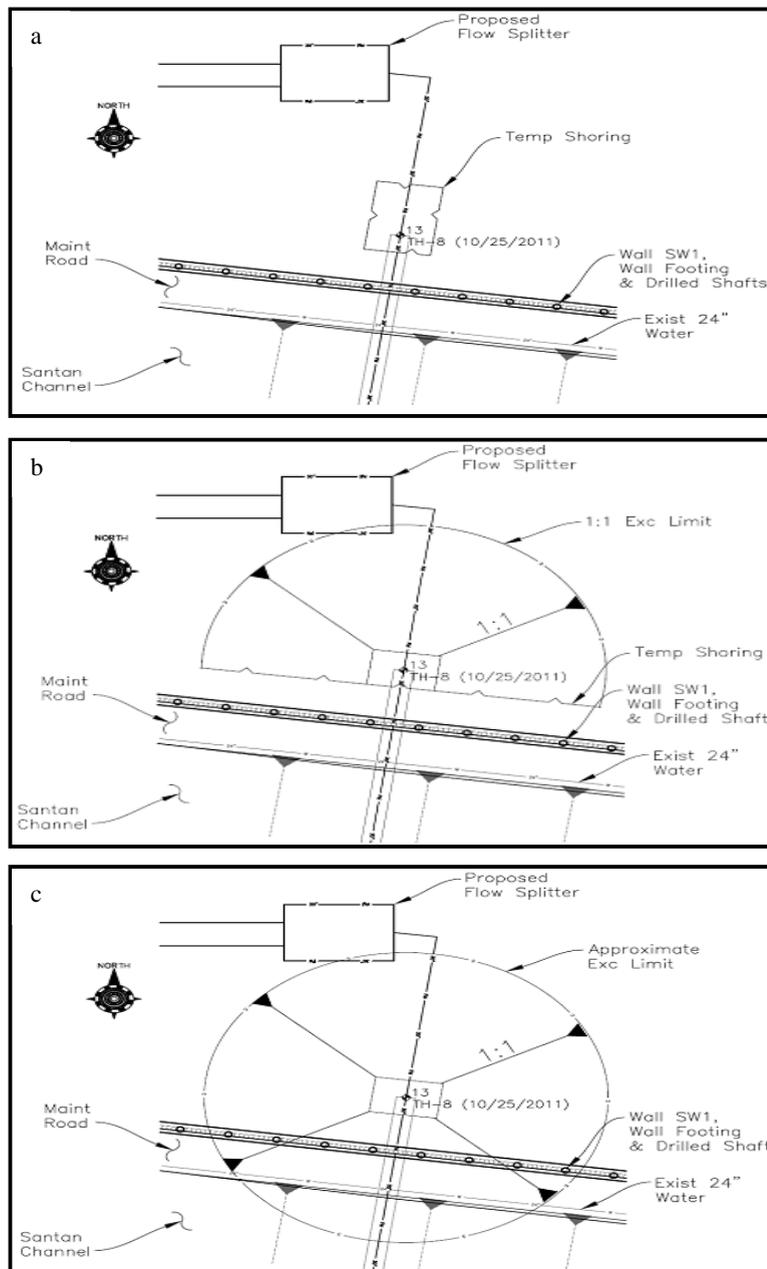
Design Plan (a) Temporary Shoring; (b) Drilled Shaft Foundation; (c) Removal/Replacement of Sound Wall
